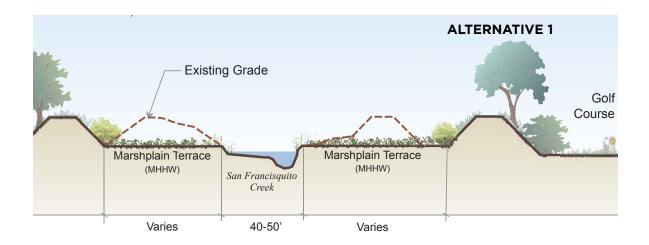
| CROSS SECTION B, VIEW LOOKING DOWNTREAM
